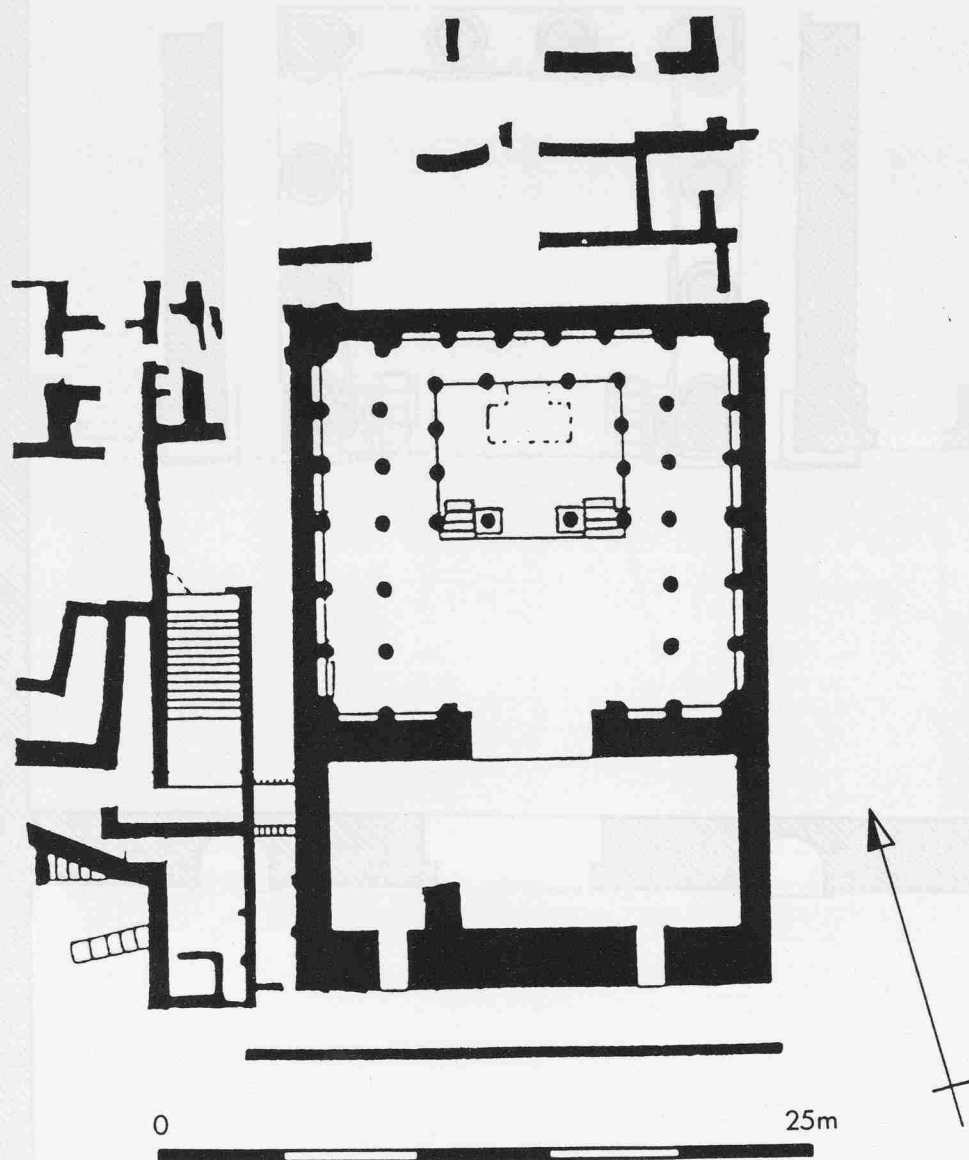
Temple of the Winged Lions, plan with adjoining structures (McKenzie 1990, plate 78b).
